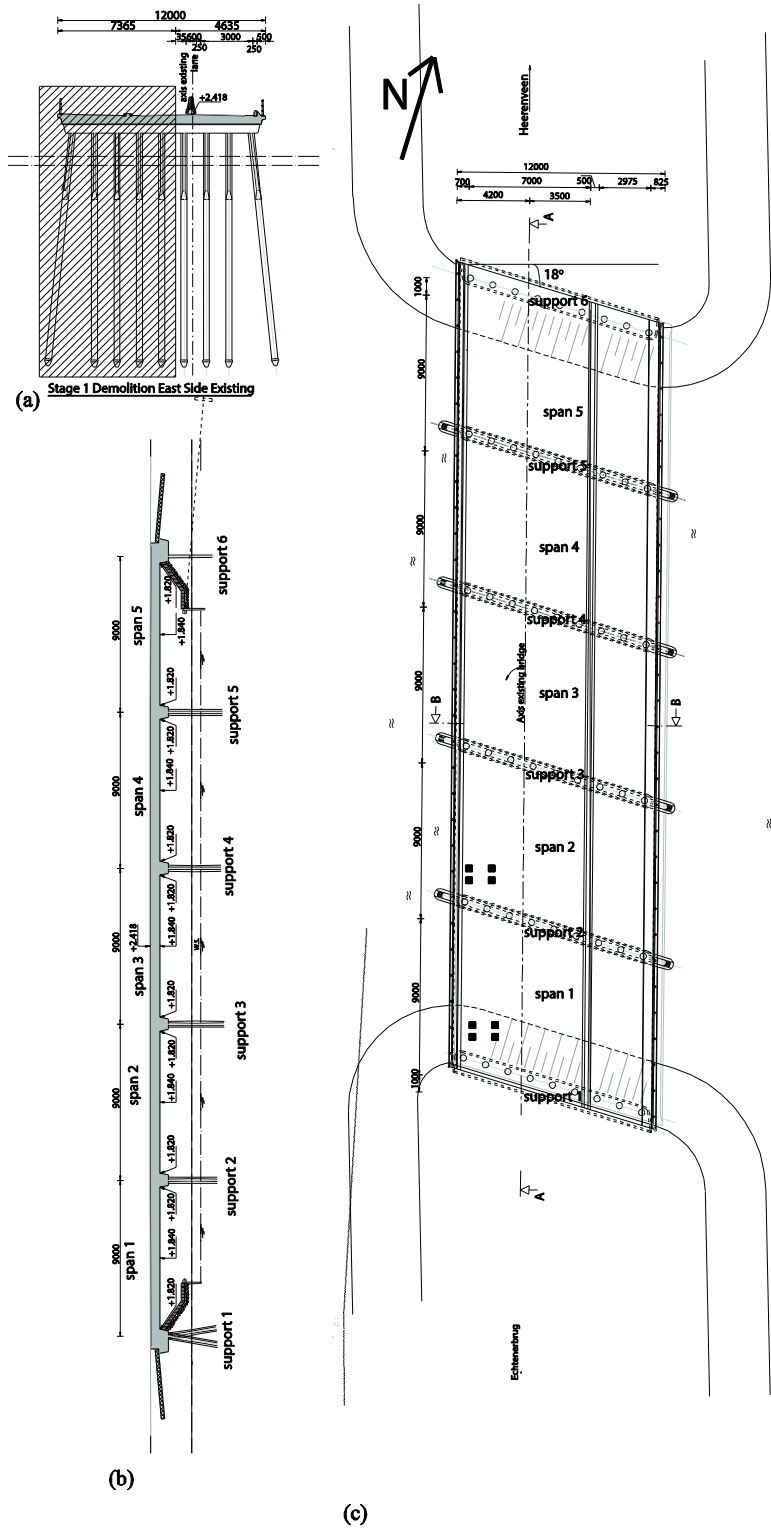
Overview of geometry of Ruytenschildt Bridge: (a) Cross-section showing the stages of demolition. The hatched area was tested to failure; (b) Side view; (c) Top view. Units: [mm].
